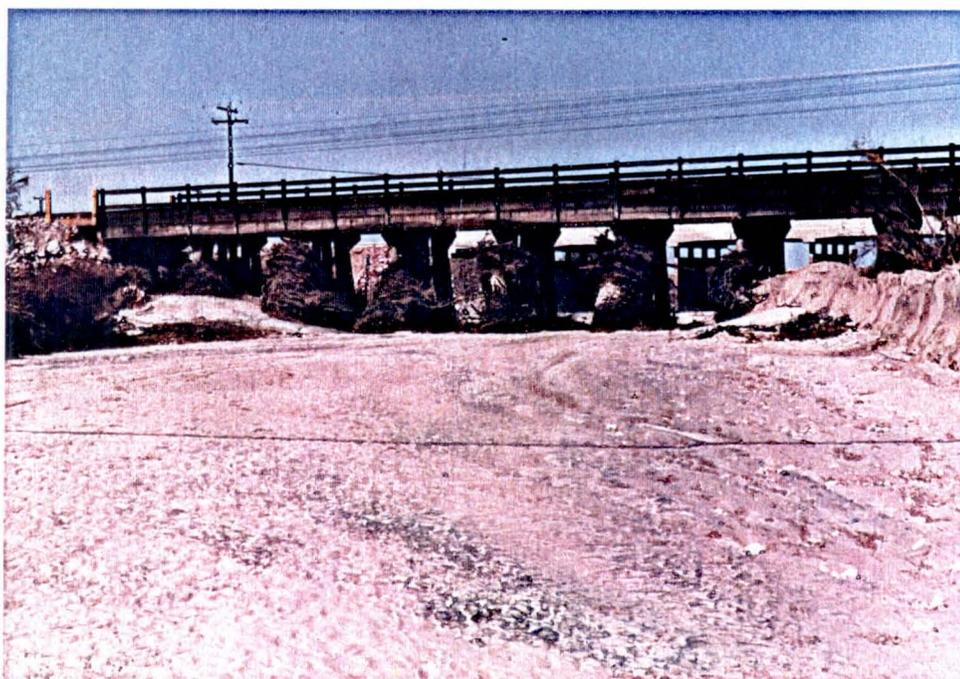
Debris Load at Santa Rosa Wash Railroad crossing.
